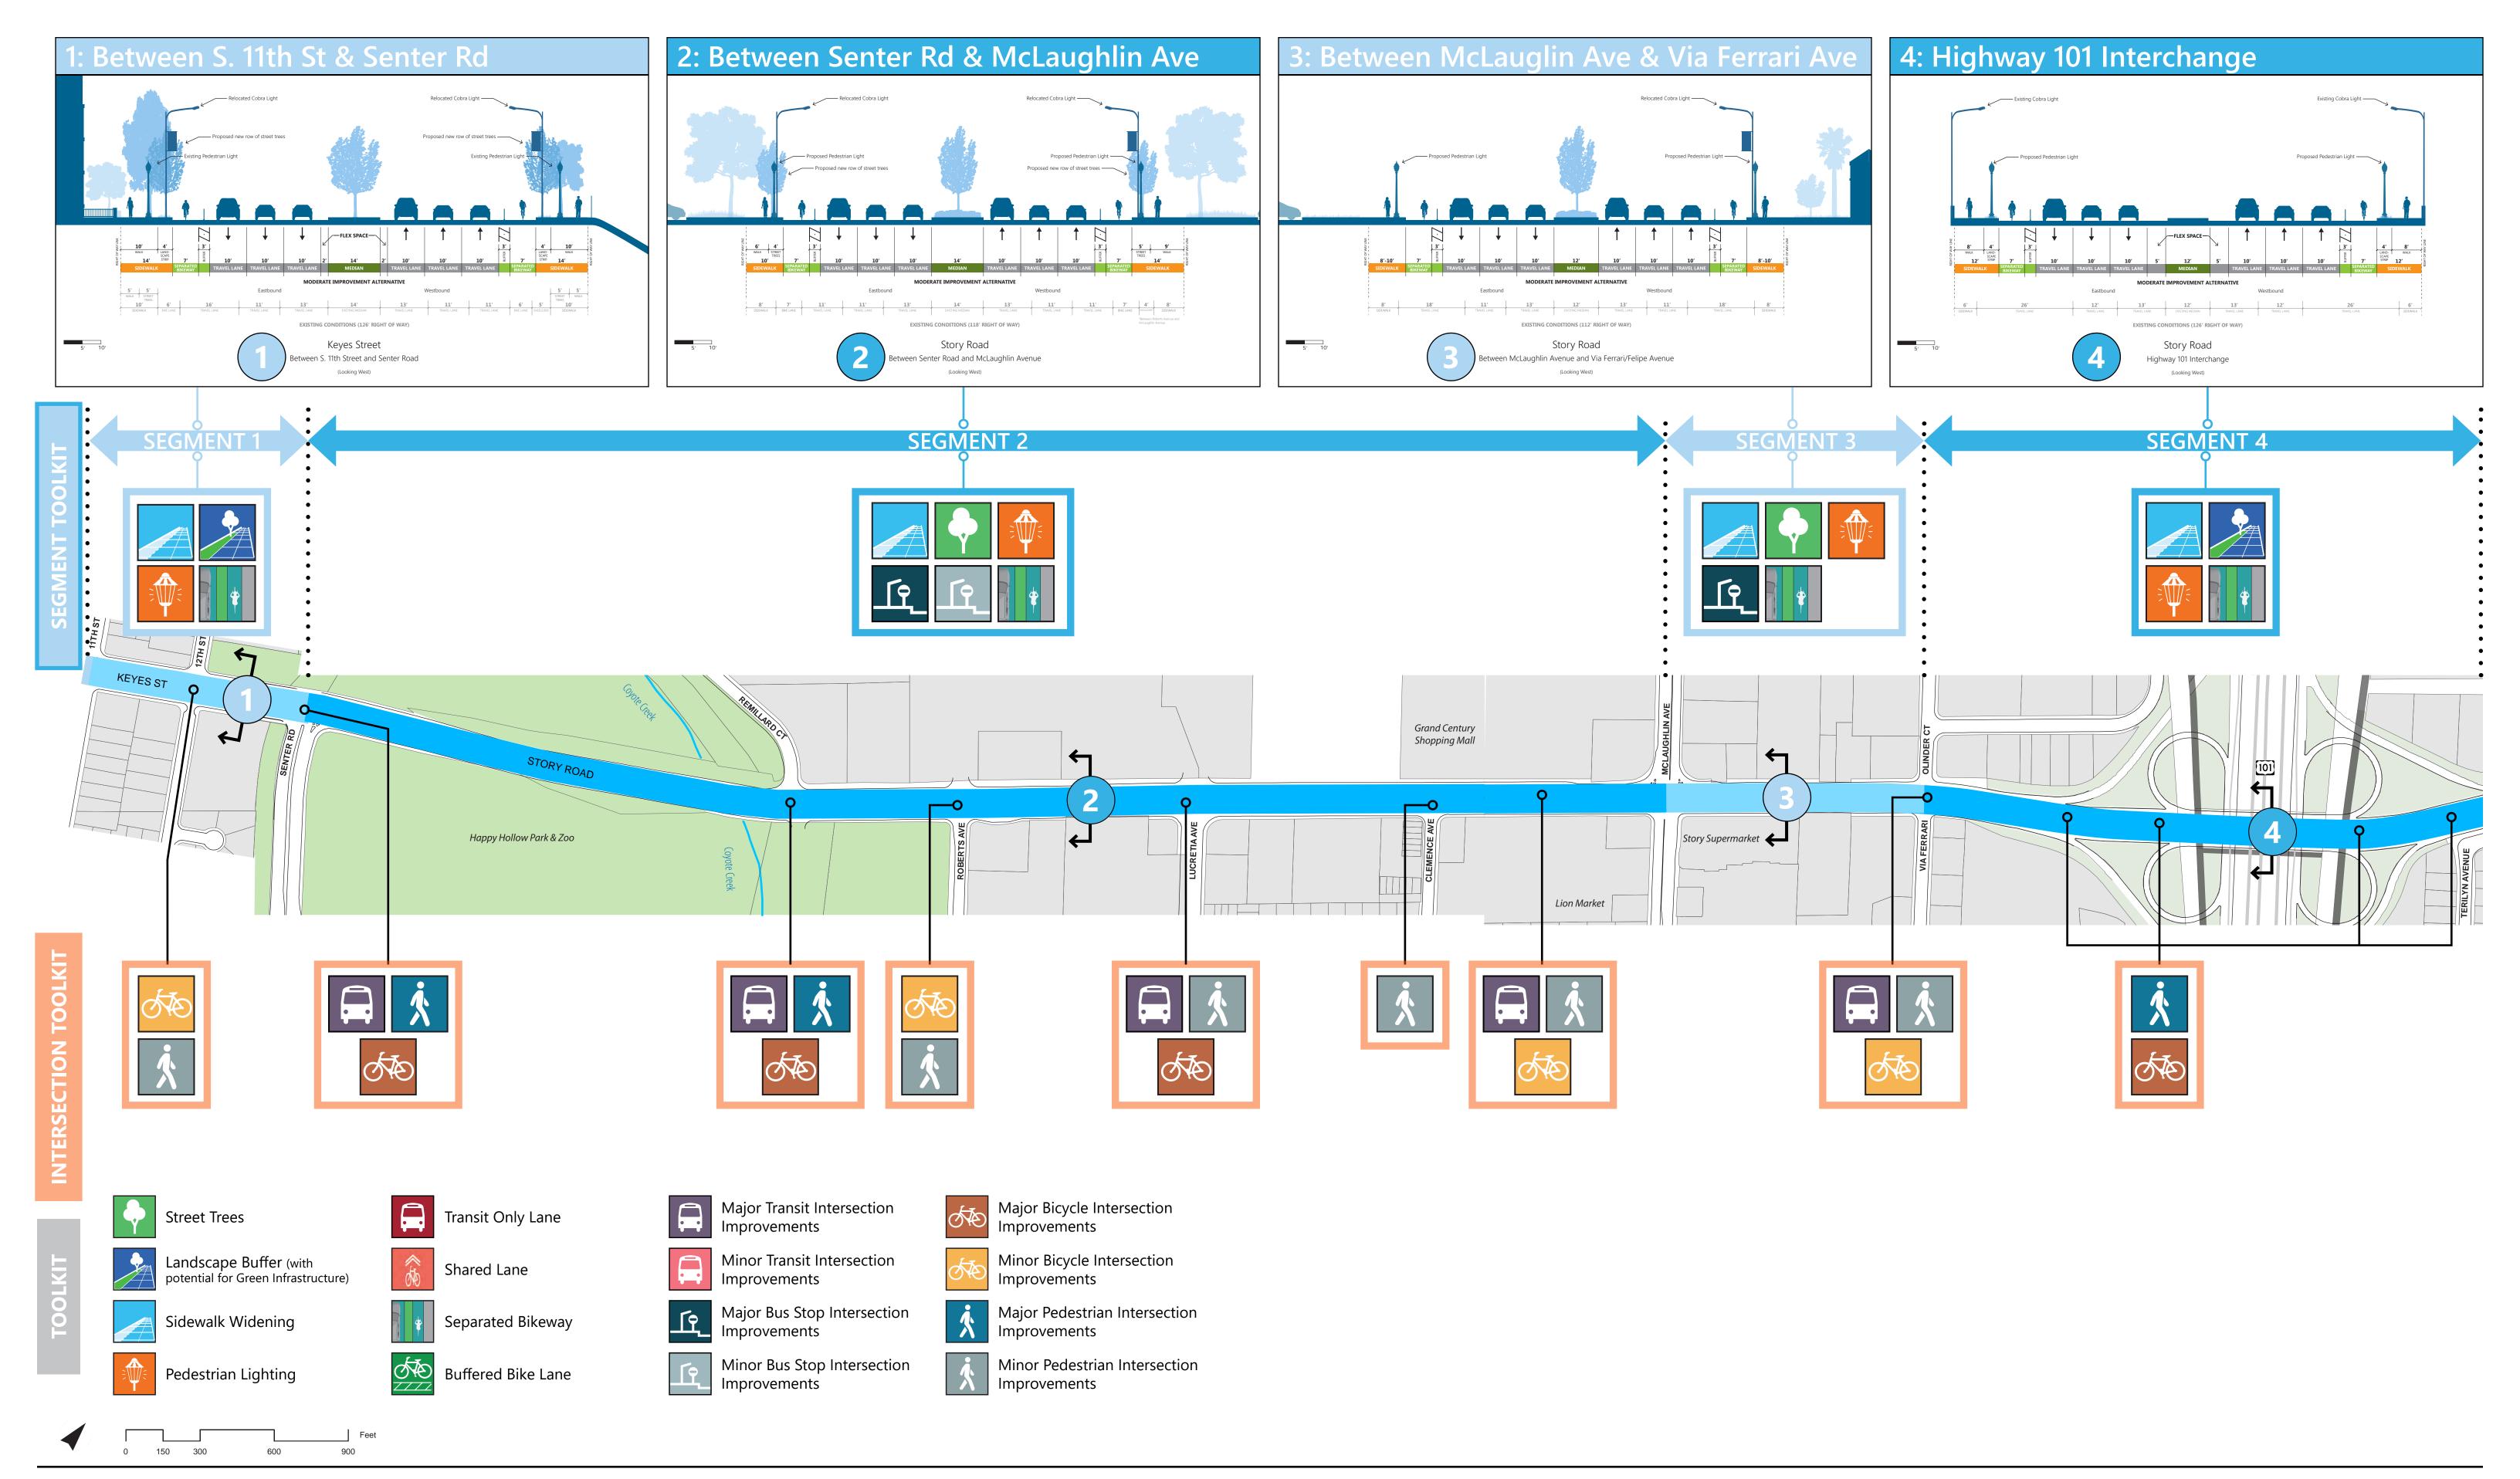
B: Keyes Street at S 11th Street to Story Road at Knox Avenue MODERATE IMPROVEMENT ALTERNATIVE
